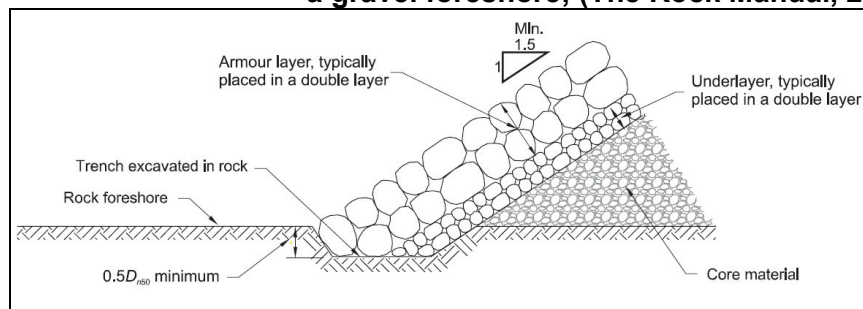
Toe detail 1b: rock foreshore - excavated trench
